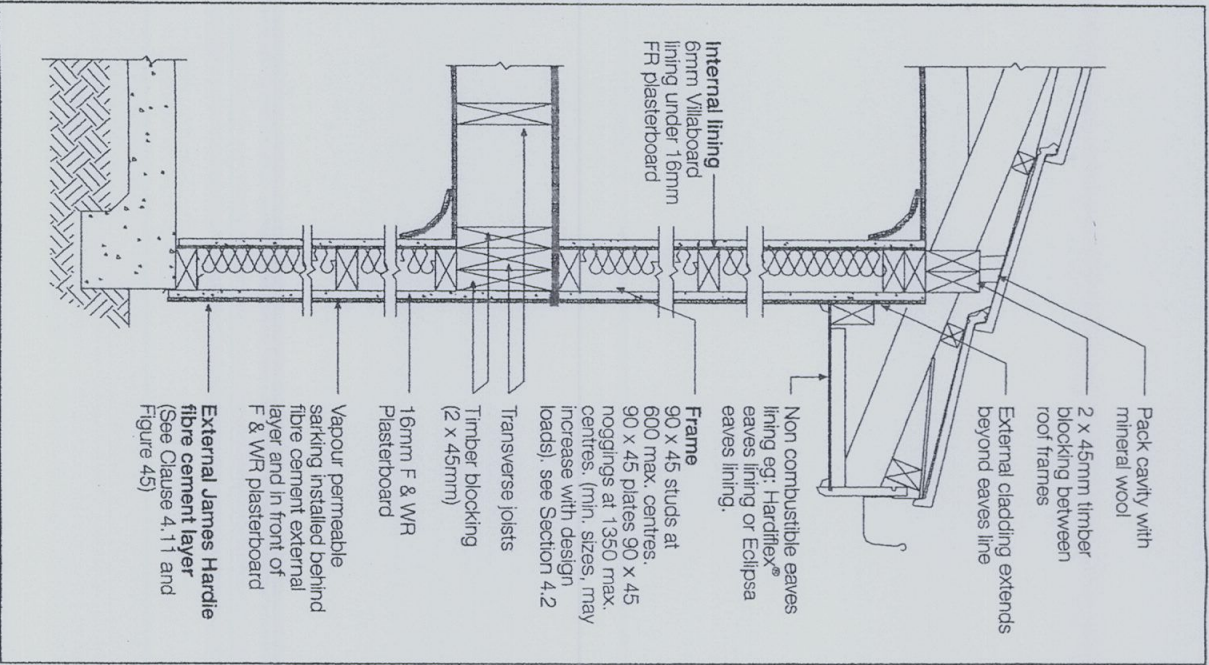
TIMBER-FRAMED EXTERNAL WALL FRL 90/90/90
